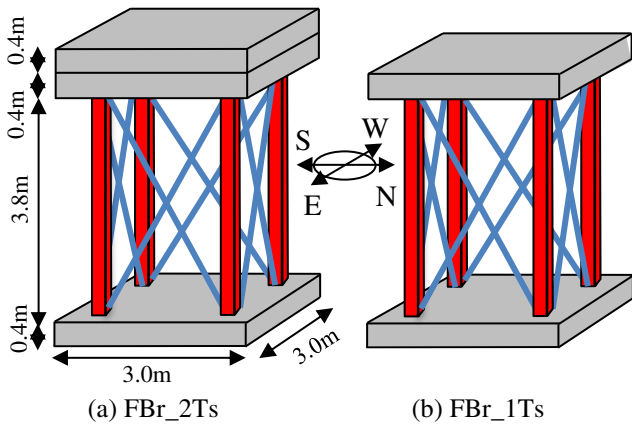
EUROPROTEAS’ structural configurations: fully braced with (a) 2 top slabs and (b) 1 top slab
